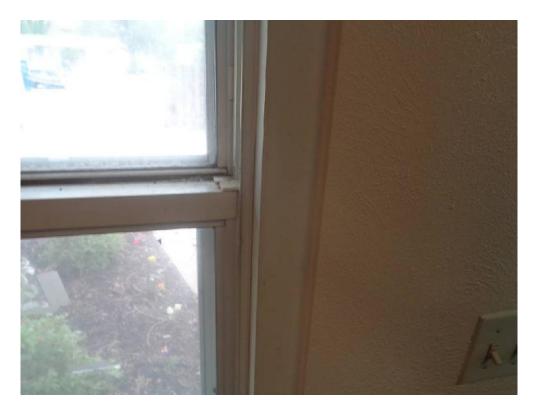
Typical view of interior white window caulk (WCA, non-asbestos) found throughout the facility.
